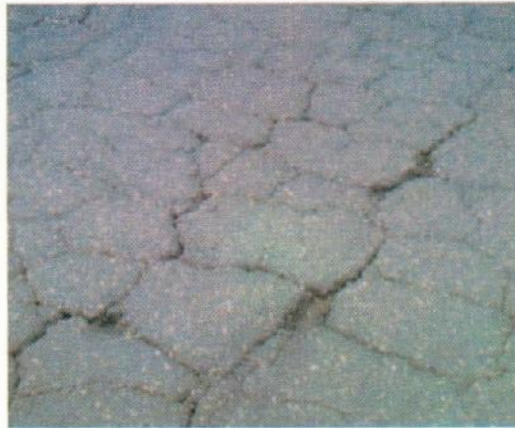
Close-up view of alligator-cracked road section to be rehabilitated.
